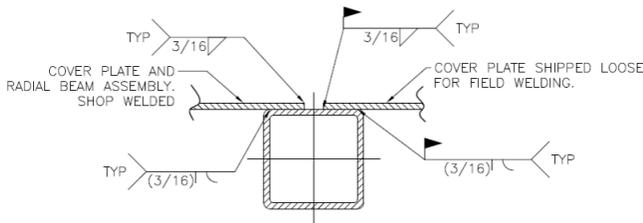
Typical Weld Detail for Radial Beam Connections
